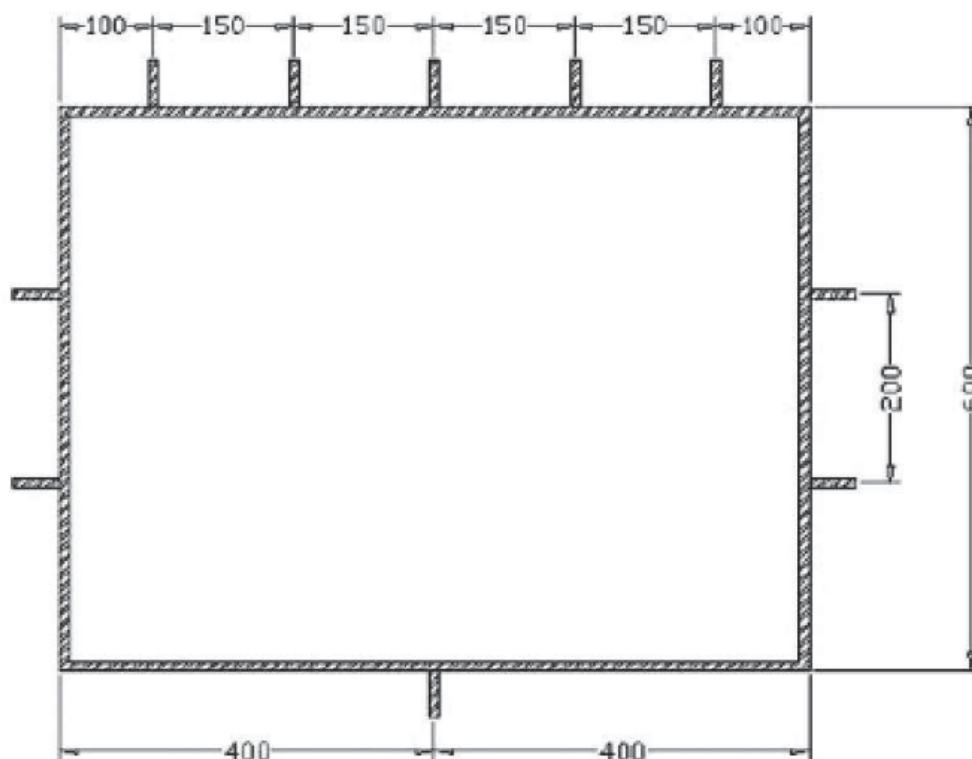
Box girder cross section (Benson et al., 2013b).
